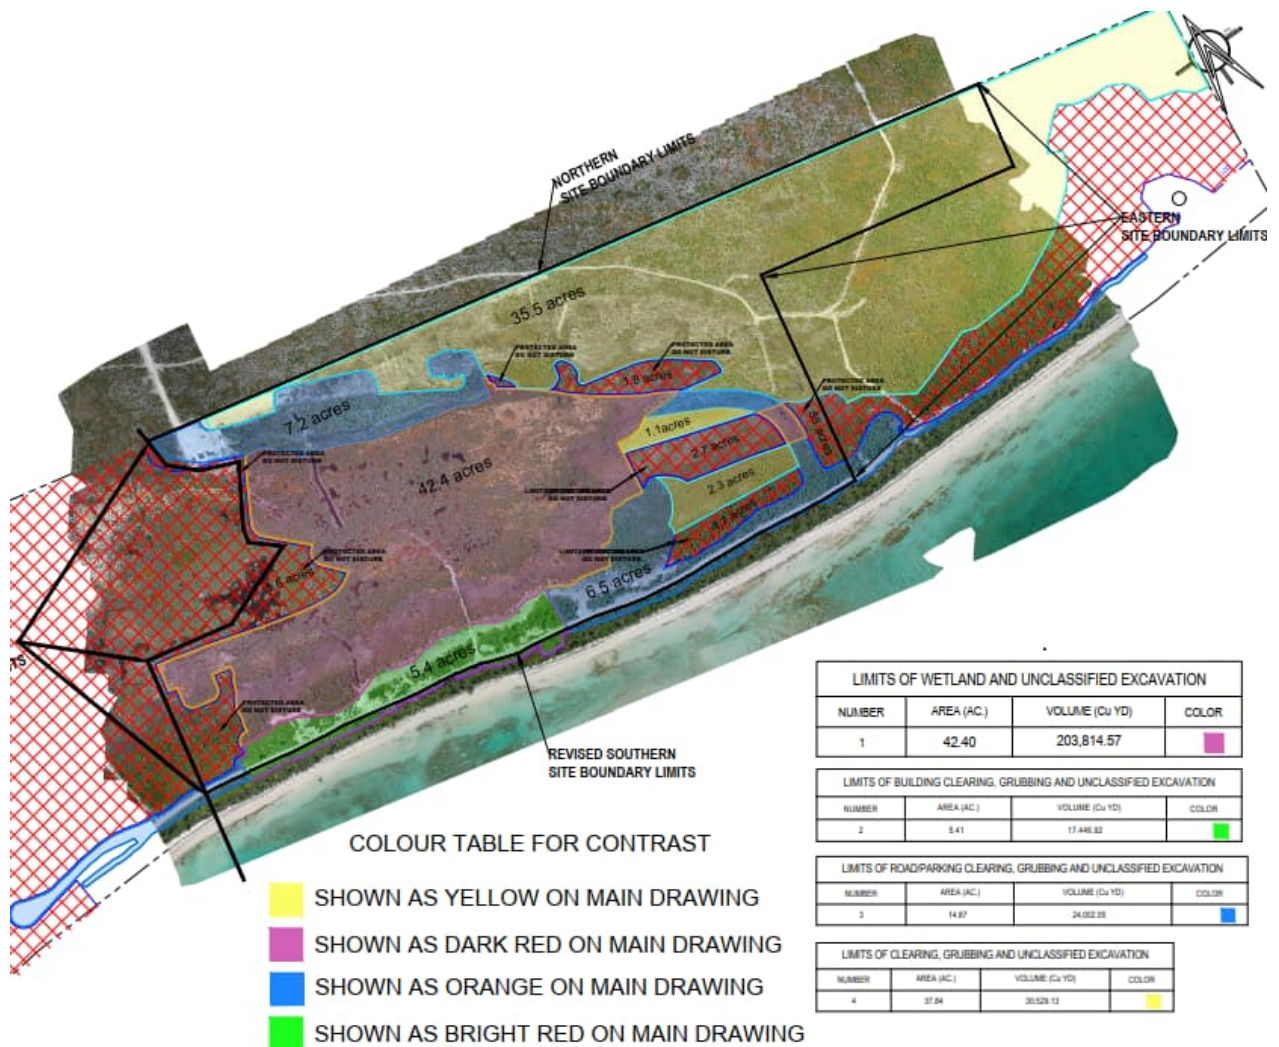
Location of the upland placement area (Mass Grading Drawing)
